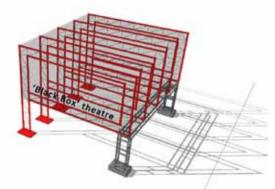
diagram of primary trusses spanning the width of the building and supported by the steel beam structure on the one side.
